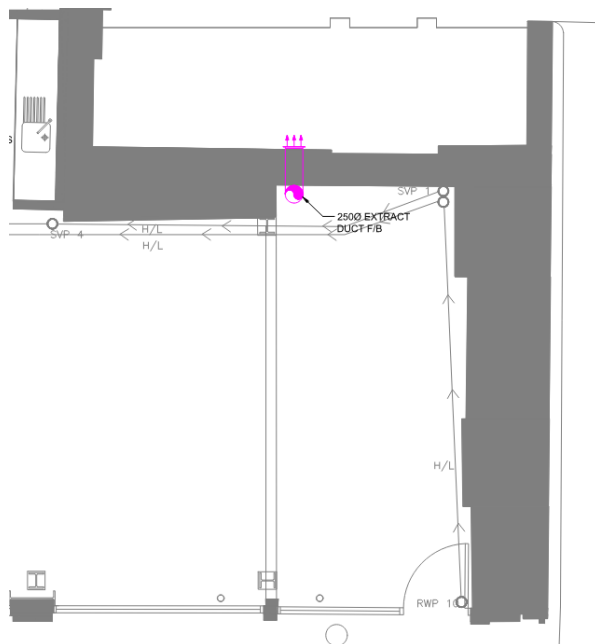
Proposed Layout – Ground Floor (Basement Extract Fan Termination)
